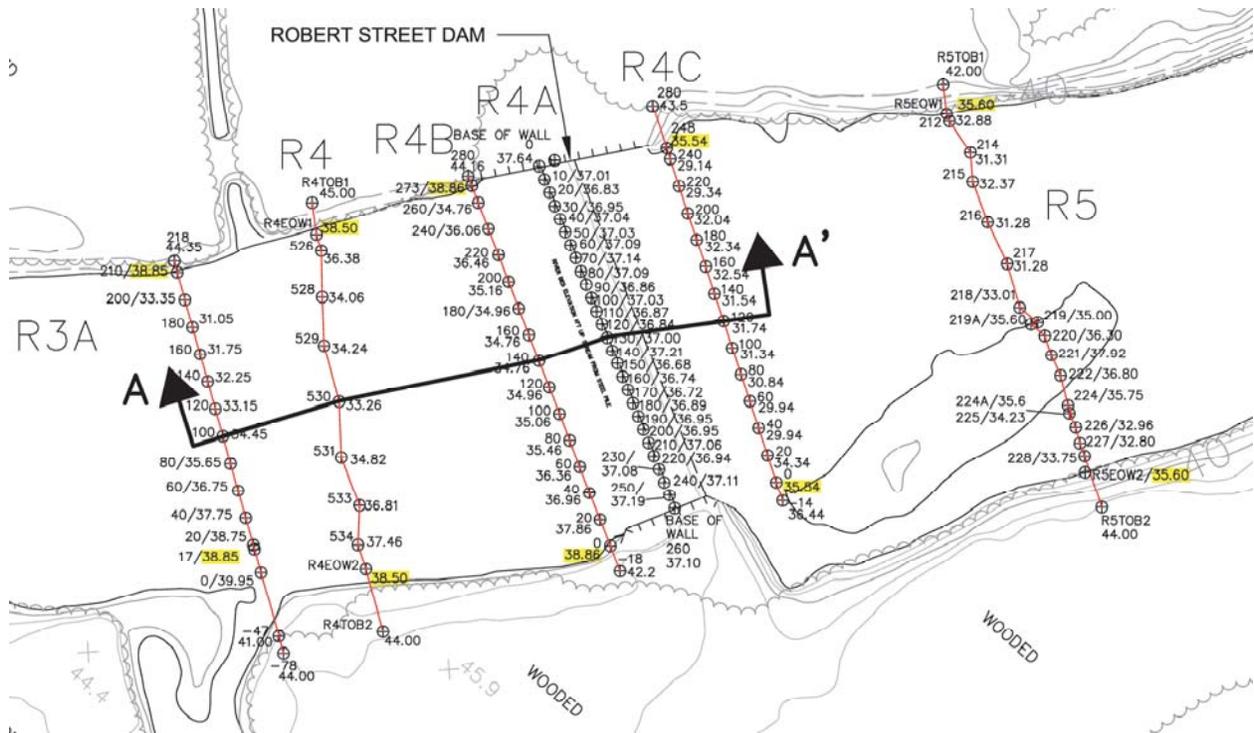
Plan view of the Raritan River survey transects nearest the Robert Street Dam.
